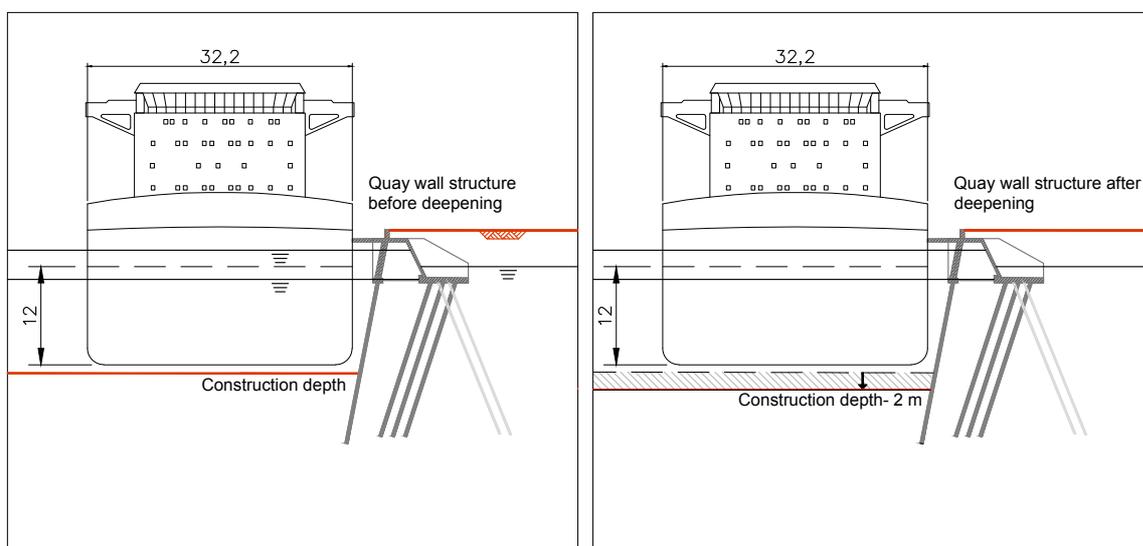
principle cross section before deepening (left side), and after deepening (right side)
